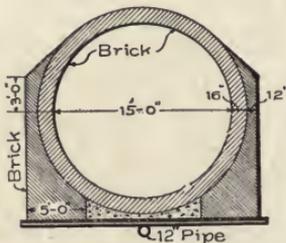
Circular Brick Sewer with Sub-drain, 64th Street, Brooklyn, N. Y.
